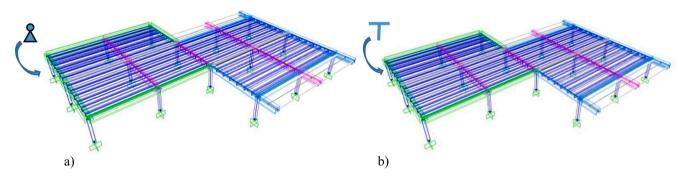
View of the finite element model of the HT- (a) and FT- (b) structure, differing for the roof beam-to-column connections.
